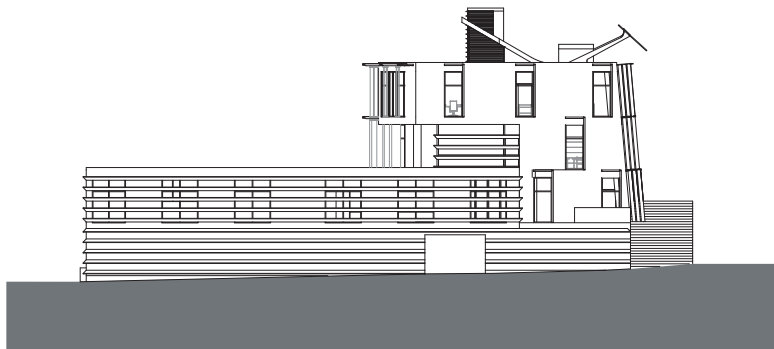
South elevation of the New Generation Office Building (Scale 1:500) Fig. 103: West elevation of the New Generation Office Building (Scale 1:500)
